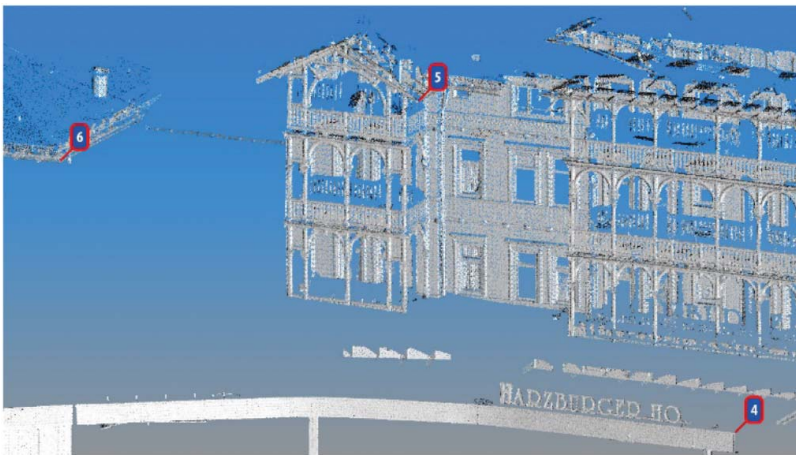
Points 4, 5, 6 on L2. Vertex of garage wall (point 4) and of roof (points 5, 6).
